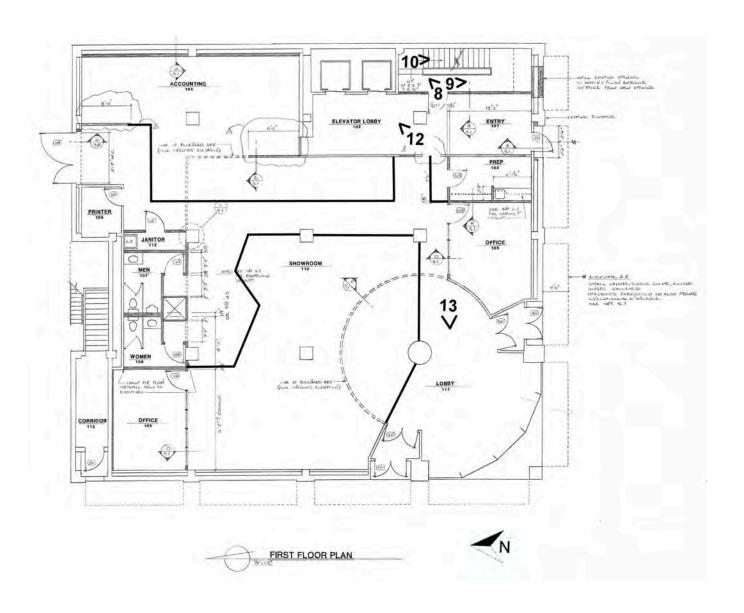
The Standard Building $Floor\ Plan/Photo\ Key-First\ Floor$
